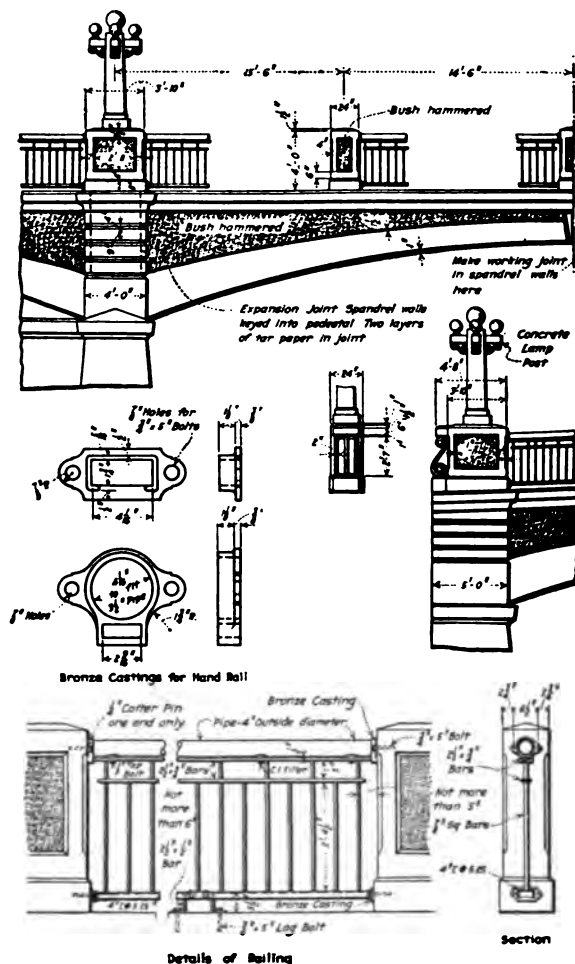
B.—Details of Pine Street bridge, Lima, Ohio.
